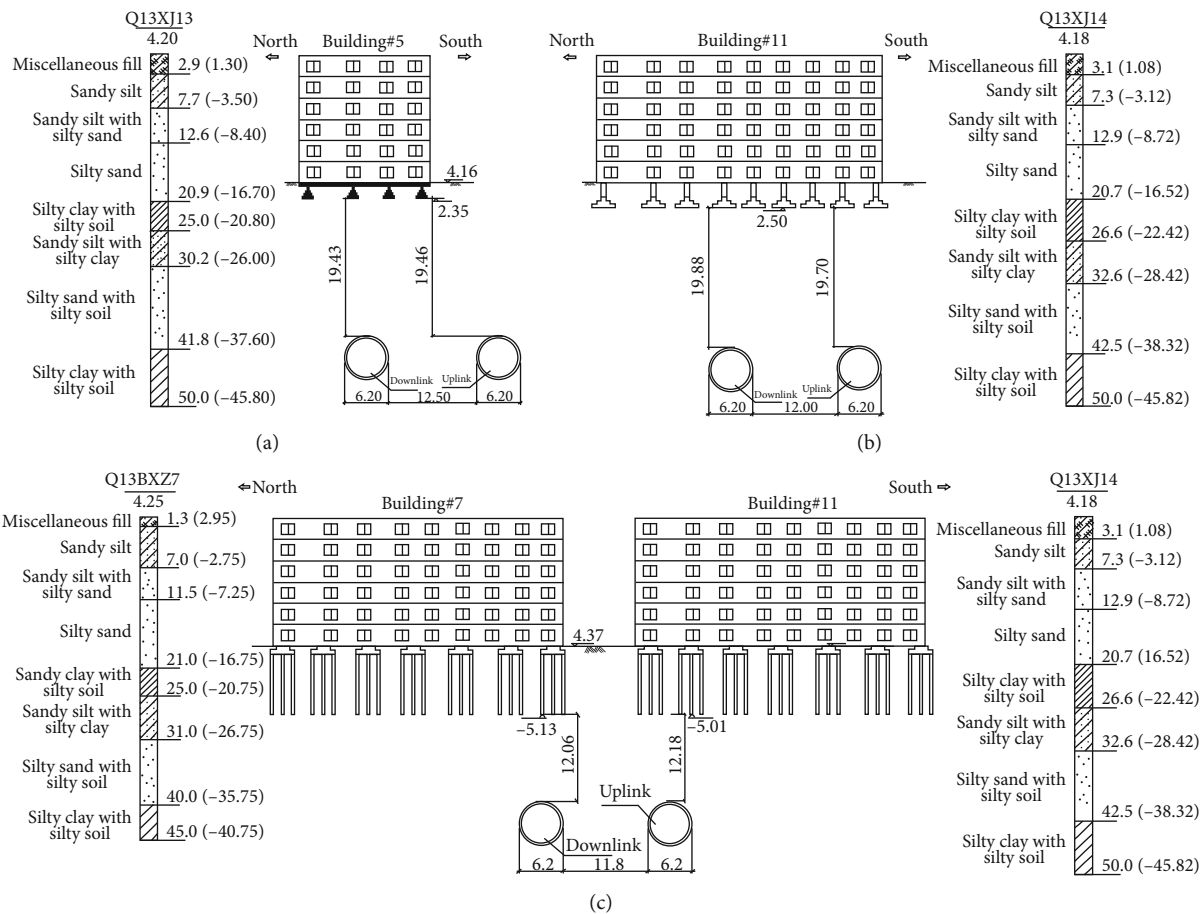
The type of tunnel underpass in the Sendadi Garden District (unit: m): (a) tunnel underneath #5, (b) tunnel underneath #6, and (c) tunnels under buildings #7 and #11.
